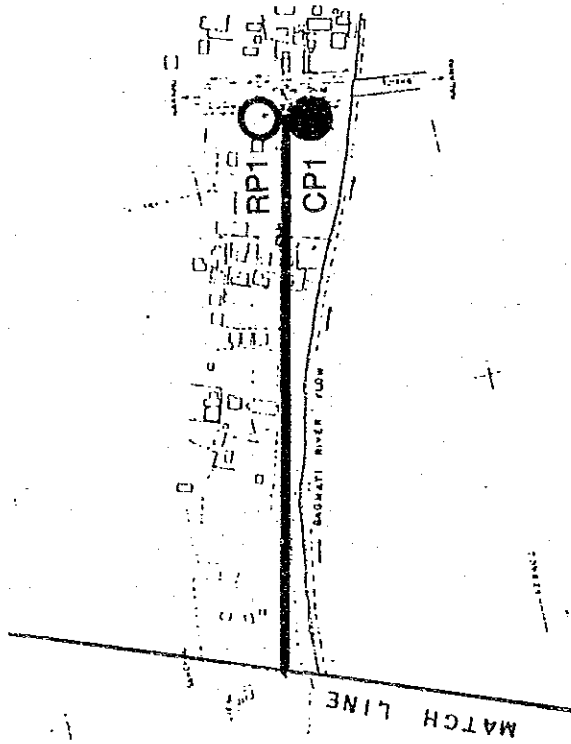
LOCATION OF ROAD PITS (1/8)
